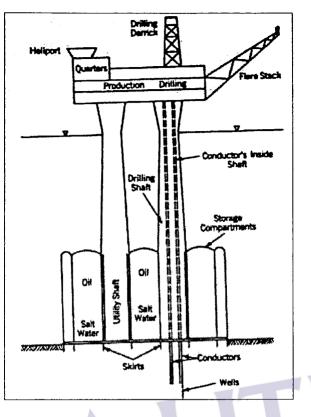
Concrete Gravity Platform – Condeep type (B.C. Gerwick, 1988)
